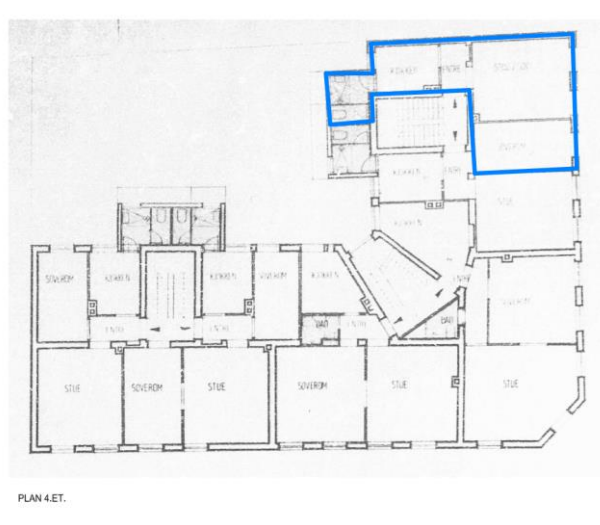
Plan drawing of the 4th floor of building at Fossveien 16. Modelled floor plan was based on this drawing. Blue stroke shows the 0_BOT apartment.
